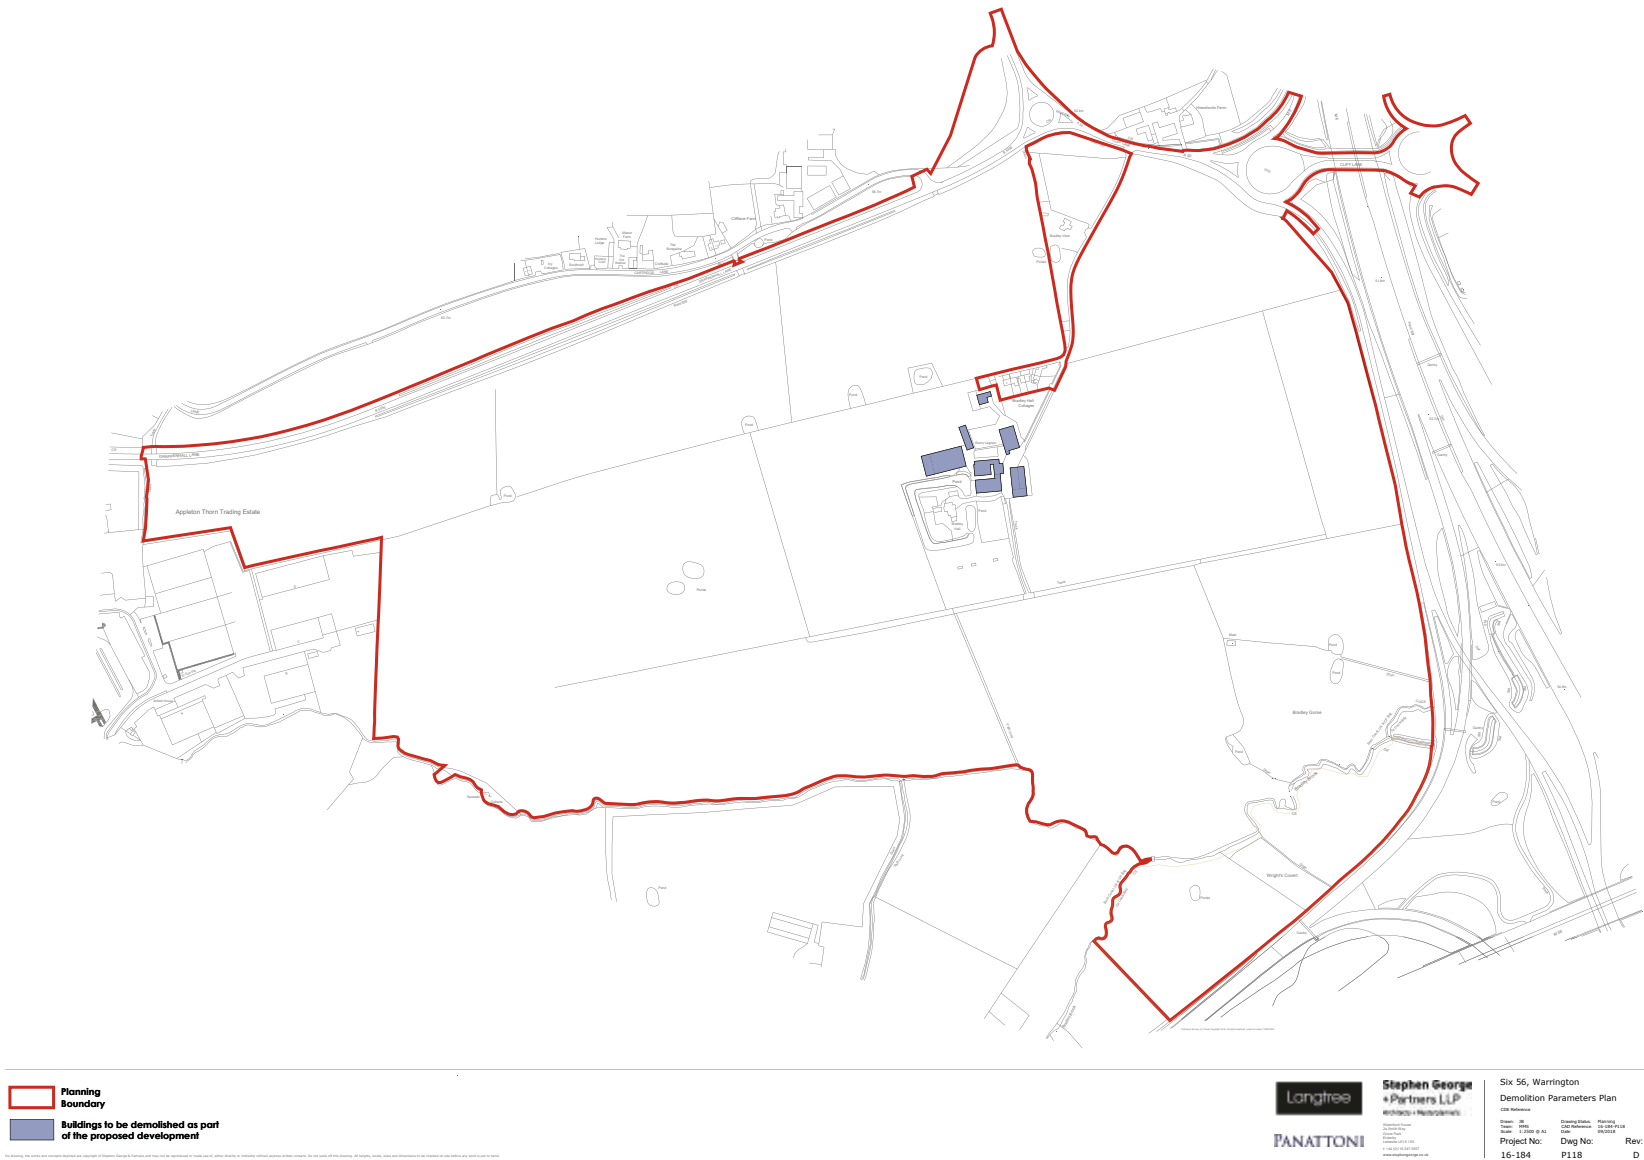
DEMOLITION PARAMETERS PLAN
